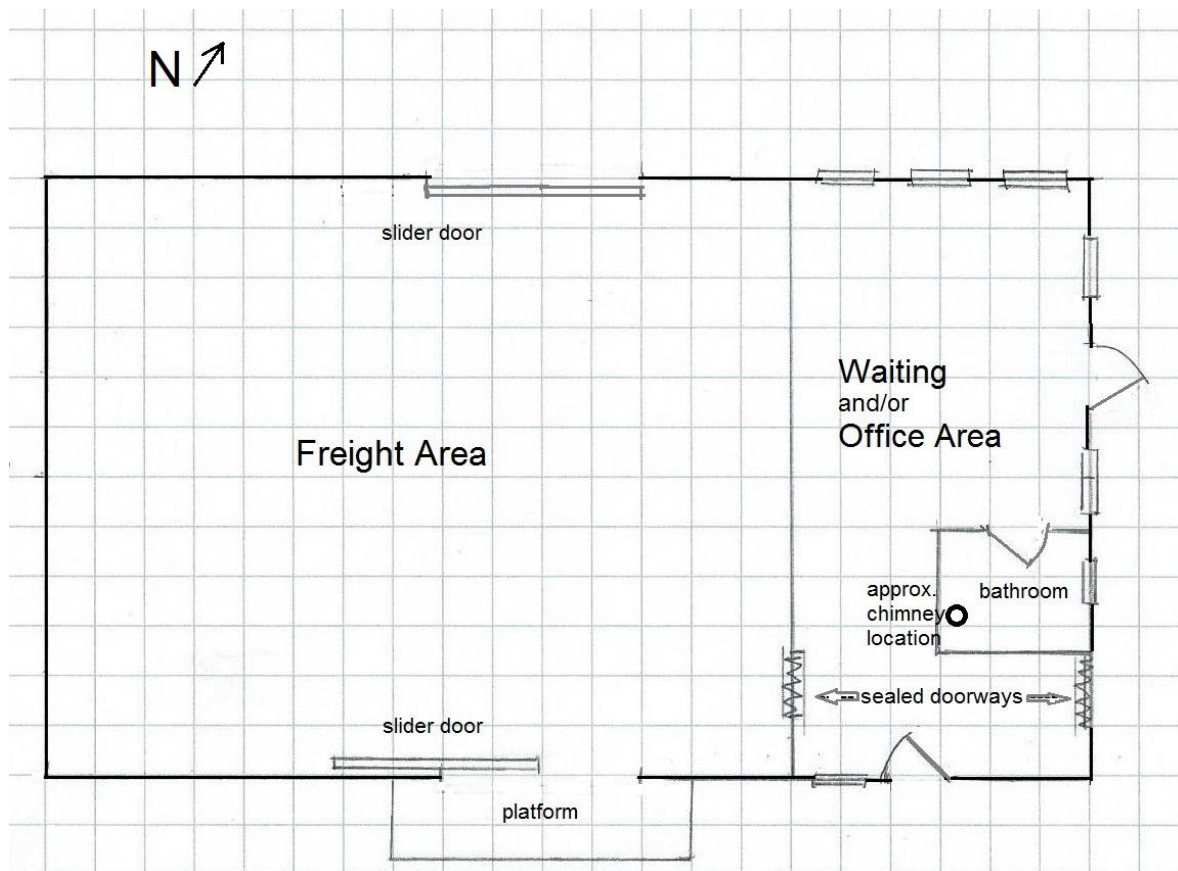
Sketch floor plan of the depot. Not to scale. Tallgrass Historians LC, 2015.
